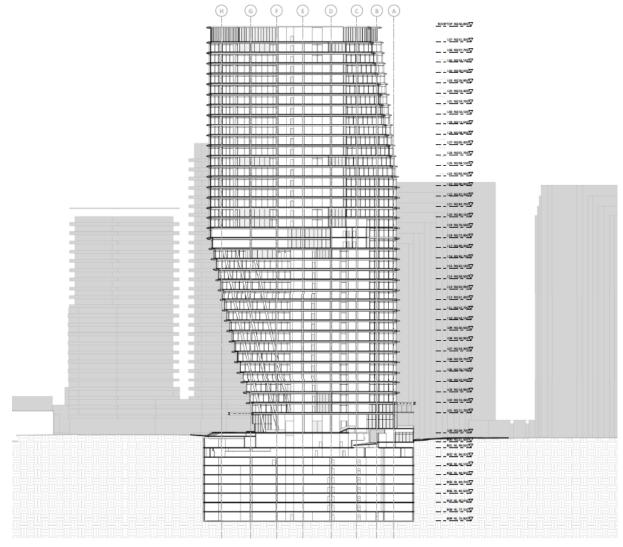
Proposed Section Plan for Reference Scheme Source: PTW 2021
